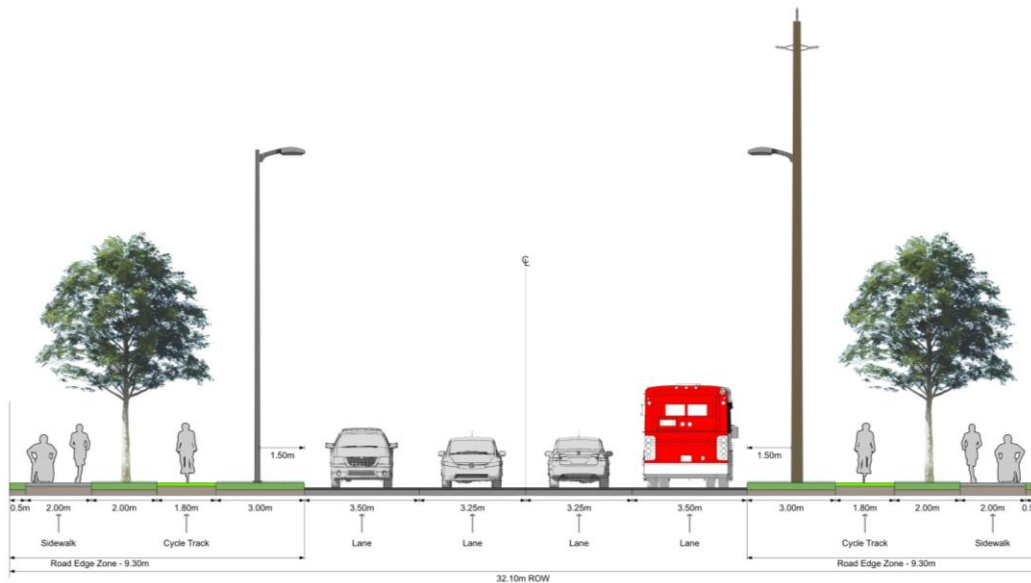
City of Ottawa Arterial Road Concept 2 – Separated Cycle Tracks / Sidewalks
